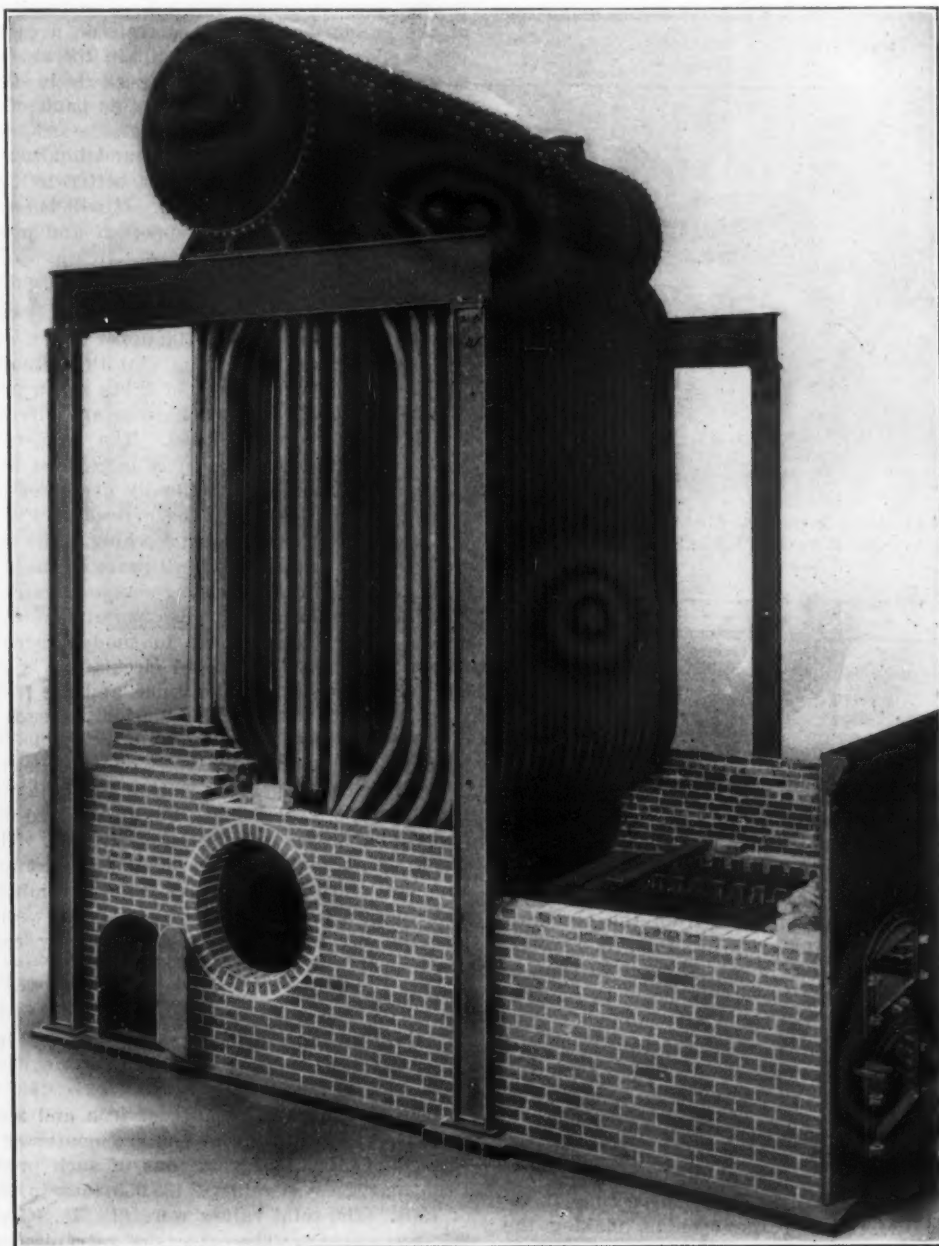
A Partly Set Boiler, Showing the Tubes and Drums.
